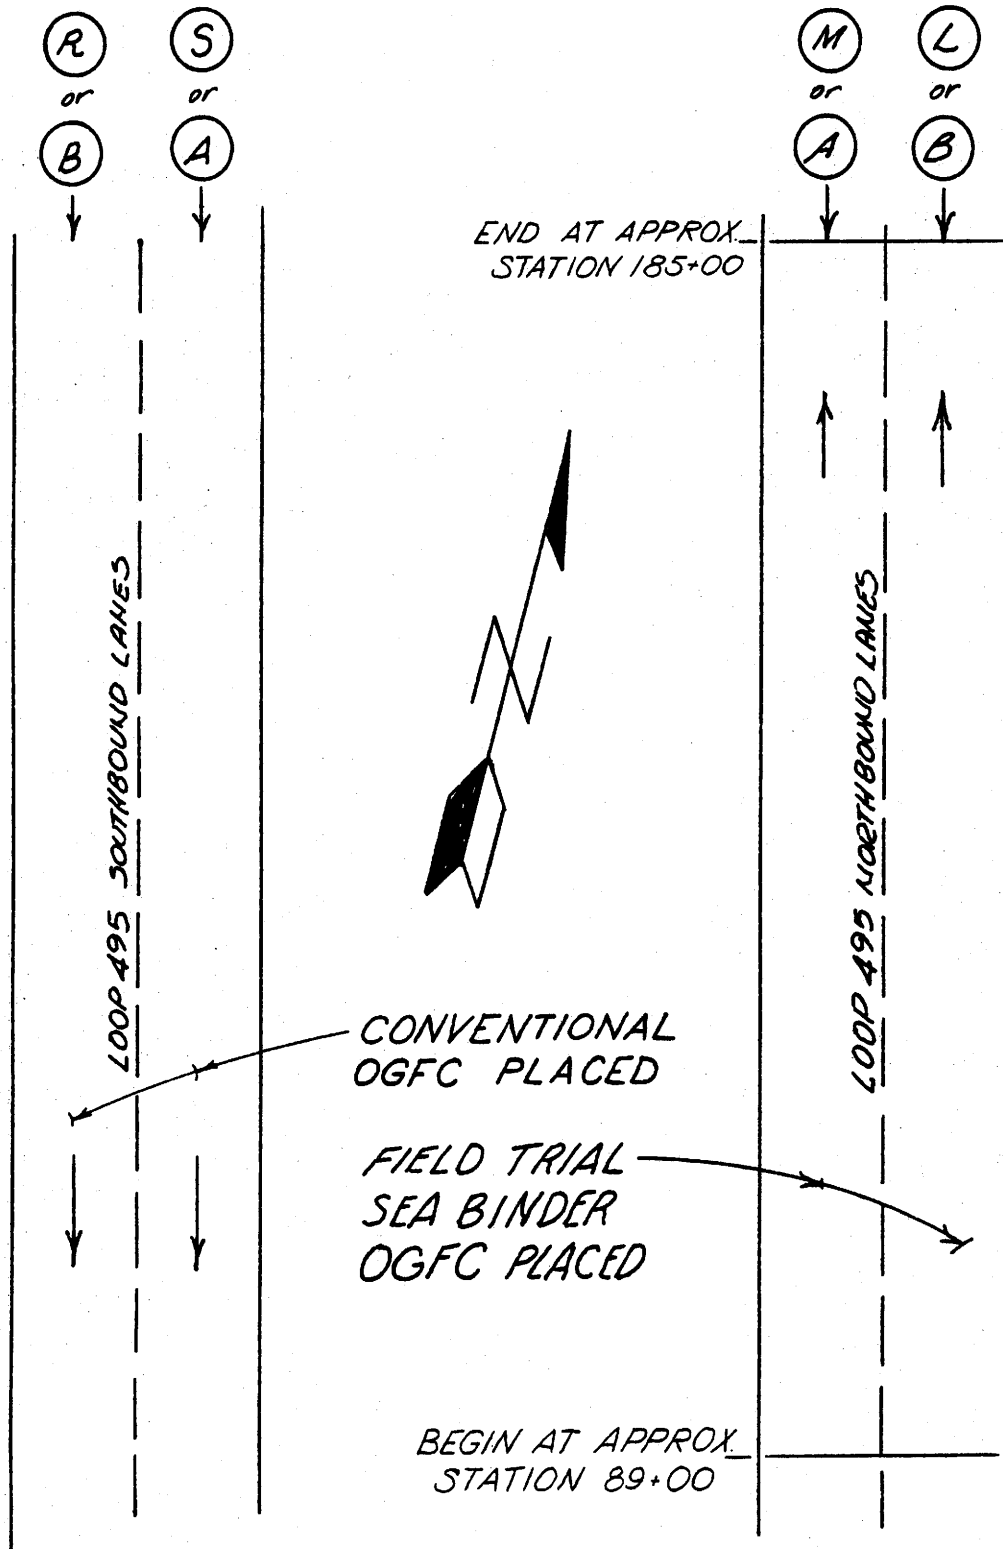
Schematic plan layout of Loop 495 travel lanes for field trials
